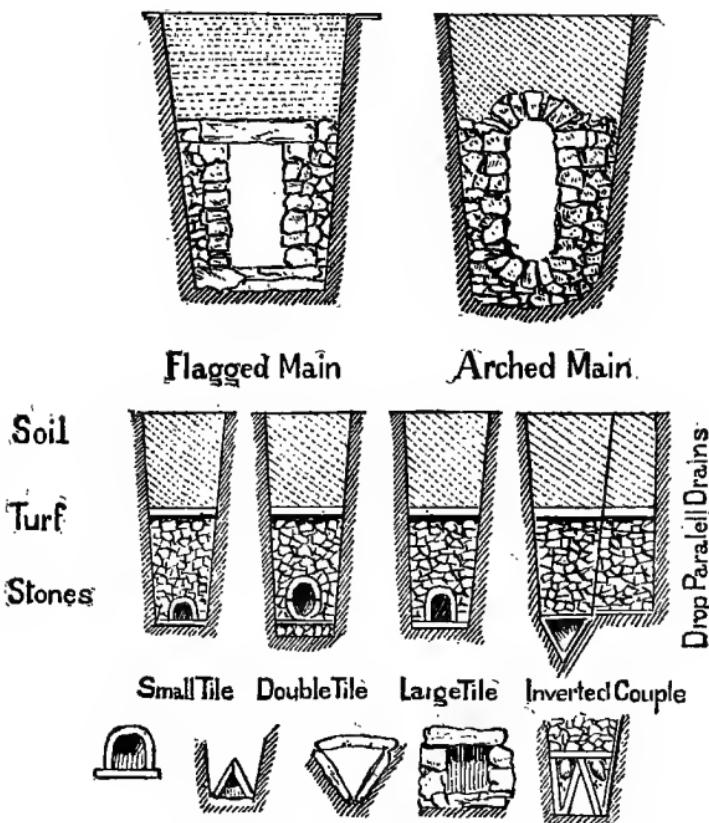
SECTIONS OF DRAINS, AFTER SMITH OF DEANSTON.
